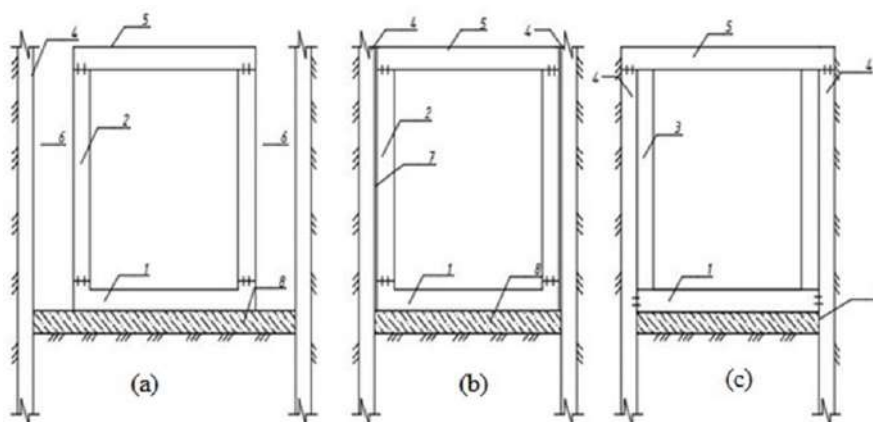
Types of methods for the construction of underground structures made of monolithic reinforced concrete: (a) – cut-and-cover method with hollows for backfilling the soil; (b) – cut-and-cover method without hollows for backfilling the soil; (c) semi-closed construction method with a load-bearing diaphragm wall; 1 – tray (foundation) plate; 2 – load-bearing wall; 3 – pressure wall; 4 – excavation enclosure; 5 – coating plate; 6 – hollows for backfilling the soil; 7 – plane of mutual displacement of the walls; 8 – concrete preparation.
